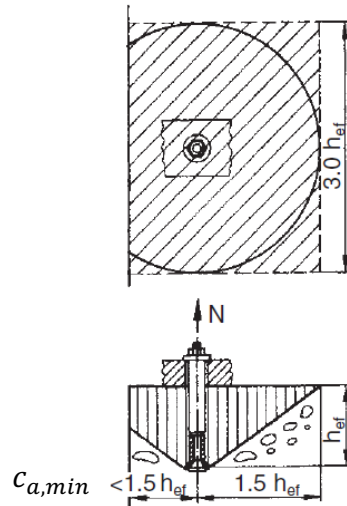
Influence of edge distance on concrete cone failure surface (adapted from Eligehausen et al. 2006)
